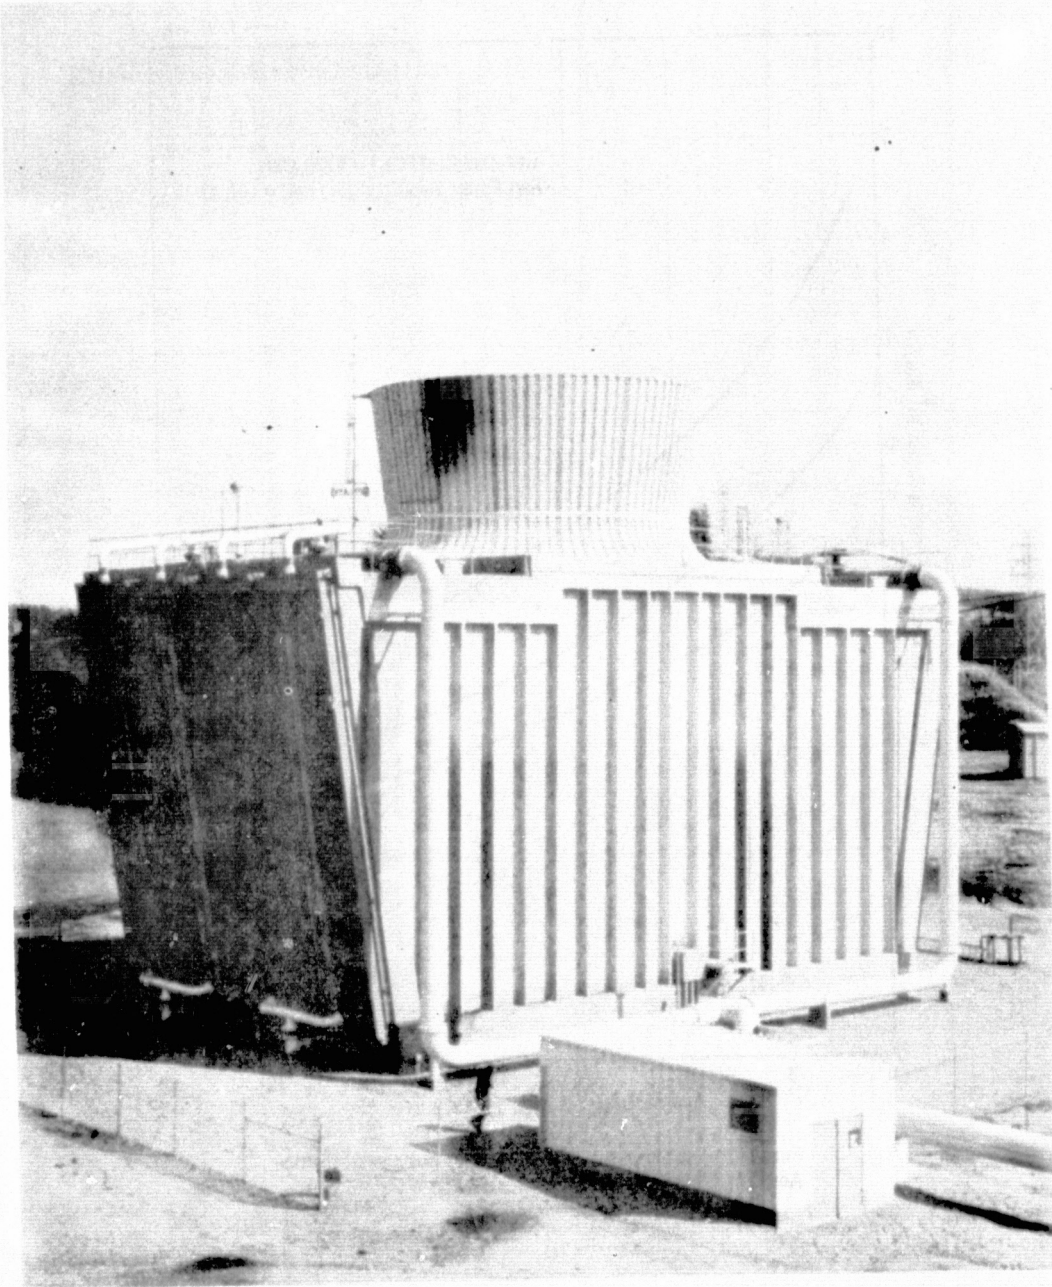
Mechanical-draft wet-dry cooling tower (concrete construction)
